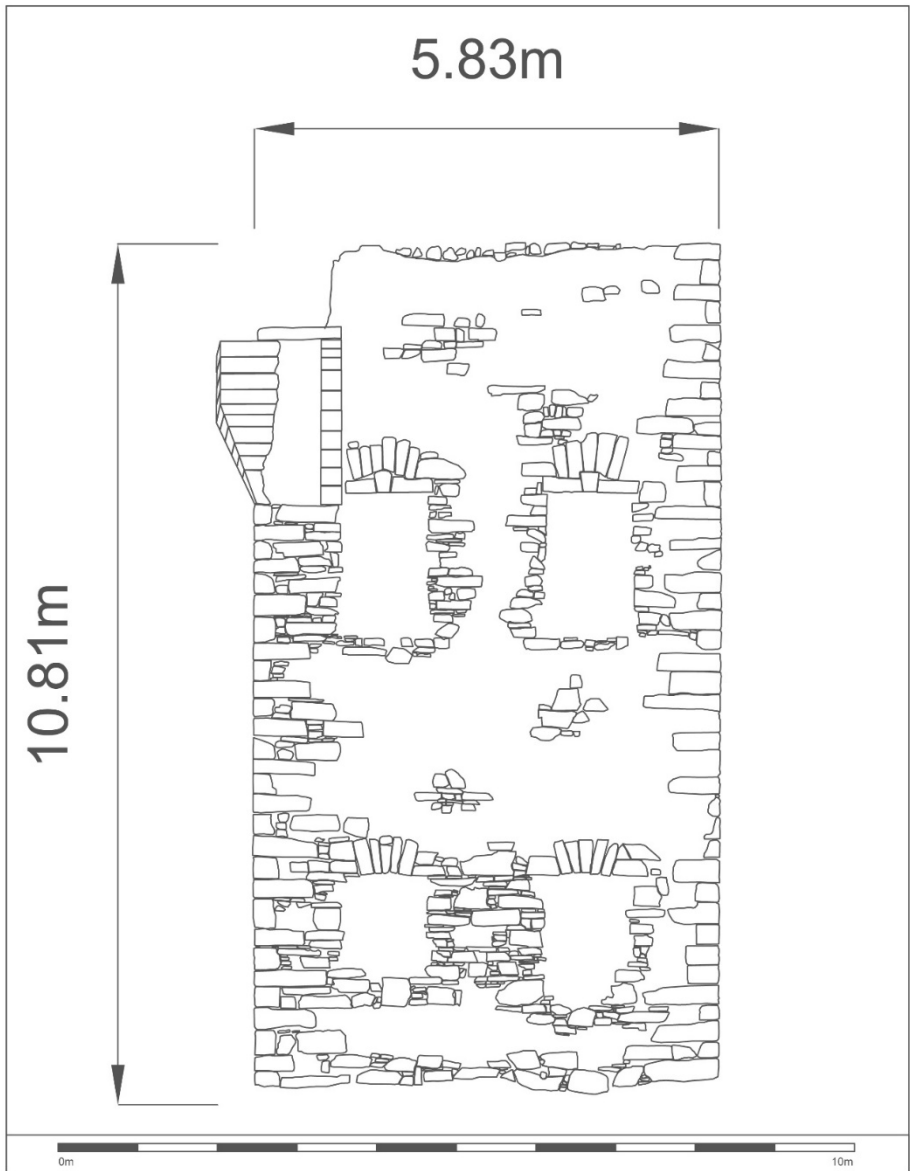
External elevation of the south-west wall of the signal tower at Crohy Head Signal Station.
